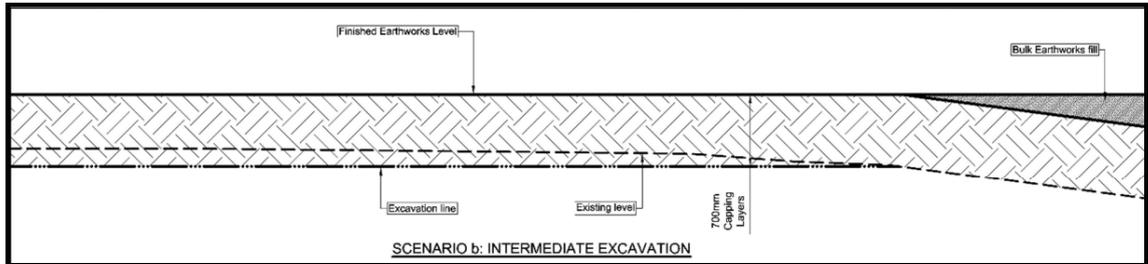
Intermediate excavation scenario (source: Walters, 2020)
